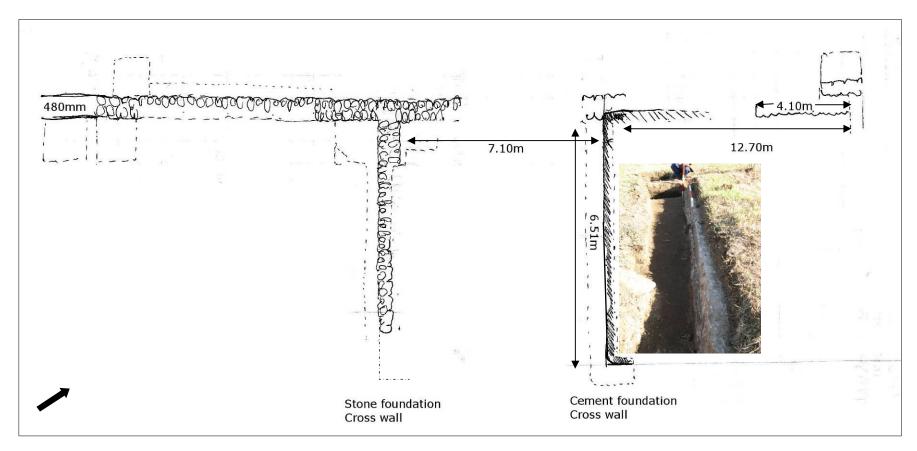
Sketch plan of the tests at the location of the 'Slave lodge'. The inserted image is of the cement foundation. An overlay with the 1992 survey of the building, suggests that this cement foundation is a subsequent cross wall in the first building shown in Figure 4. There is not an exact match between the 1992 manual survey and the 2009 electronic survey.
